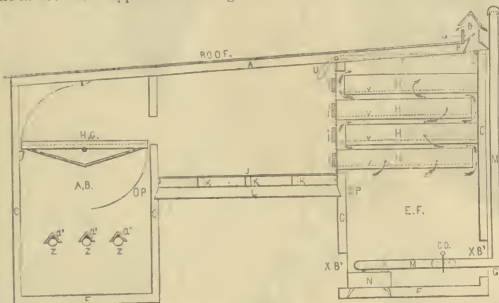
LONGITUDINAL SECTION OF DRYING HOUSE.
